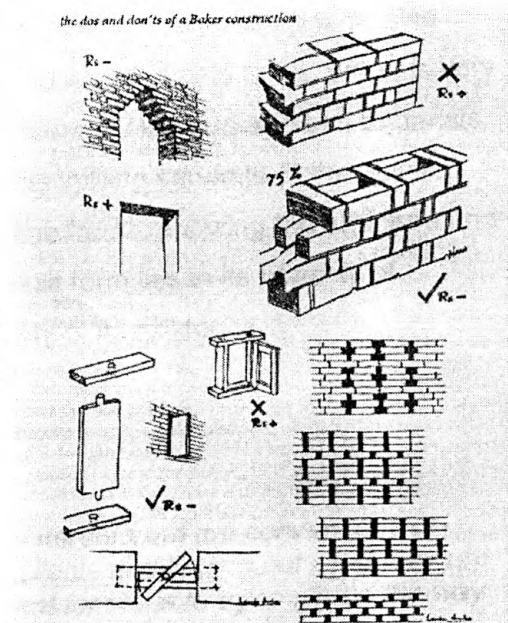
Laurie Baker's list of do's and don't's of building construction.
